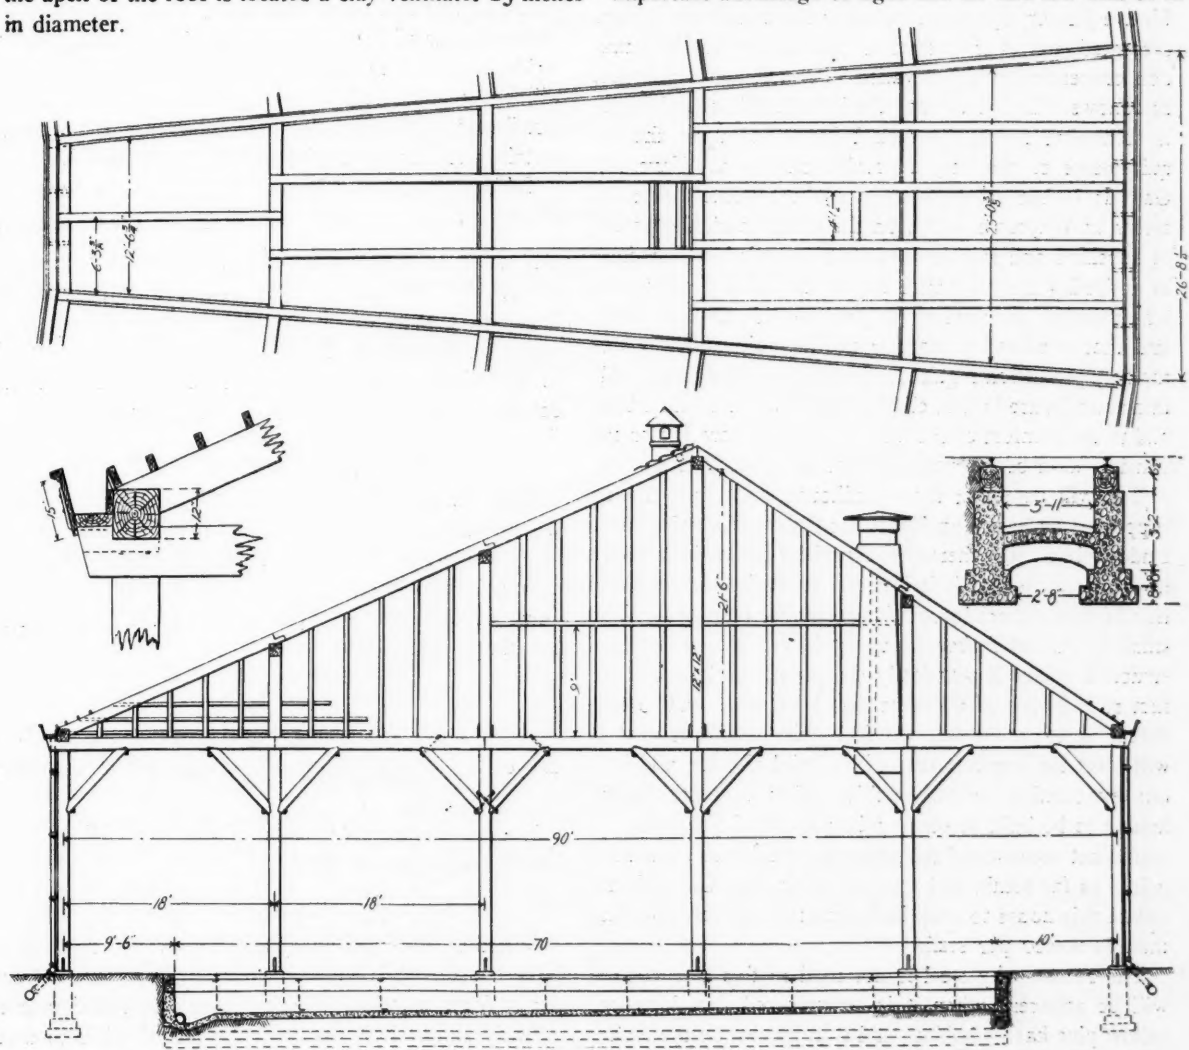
SECTION AND PARTIAL PLAN WAYCROSS ROUND HOUSE, ATLANTIC COAST LINE
